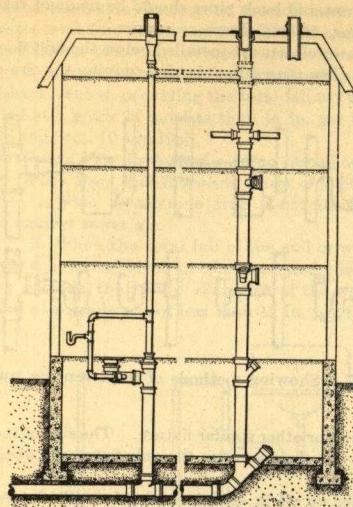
Methods of venting, roof-flashing, and locating of soil, waste, and vent fittings.
